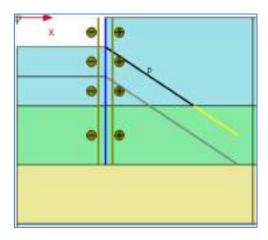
Phase 2, activation of the anchor and geotextile (grouting). Pre-stressing of the anchor to a value of 300 kN/m.
